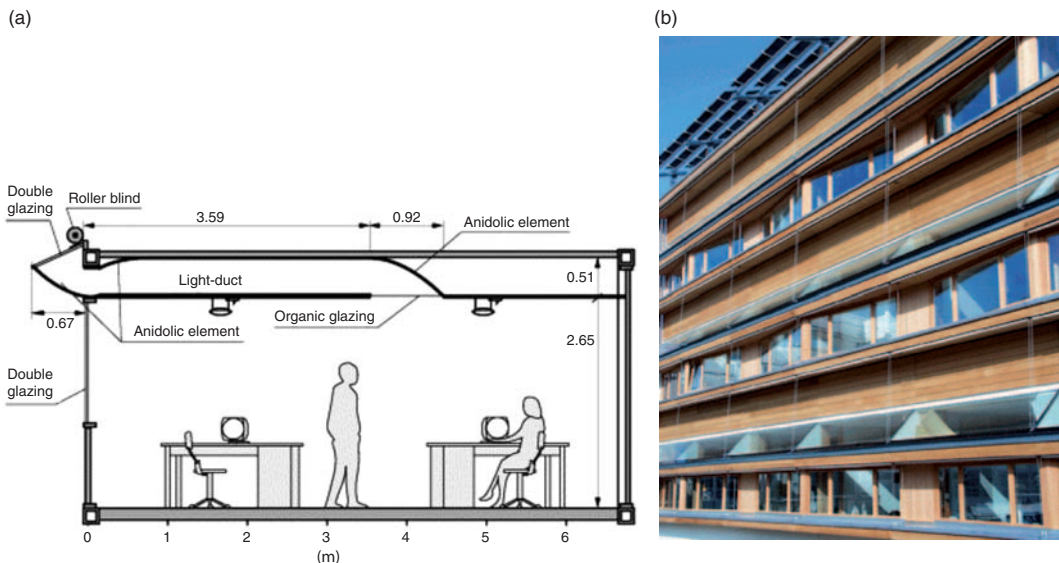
(a) The anidolic ceiling principle; (b) A façade incorporating an anidolic ceiling collector
